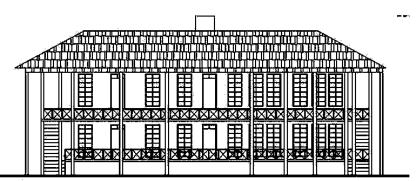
South elevation of a traditional building in Rasht (Memarian, 2006)
